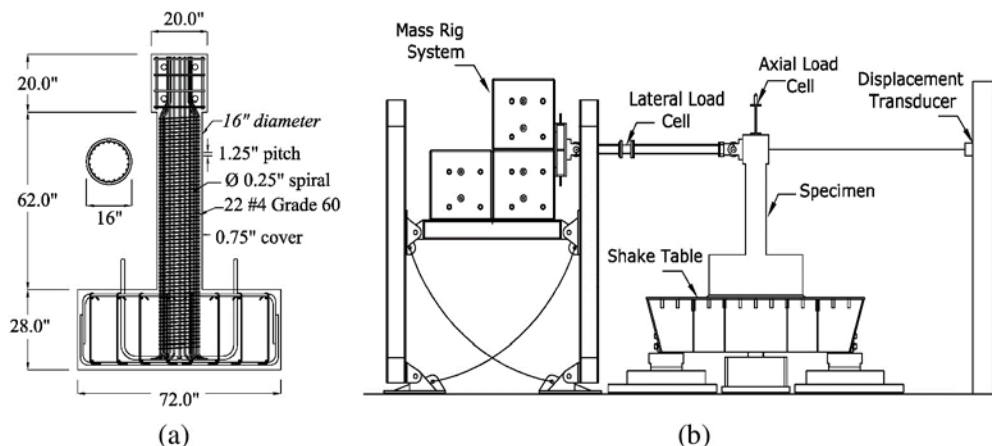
(a) Specimen details and dimensions (b) Test setup
